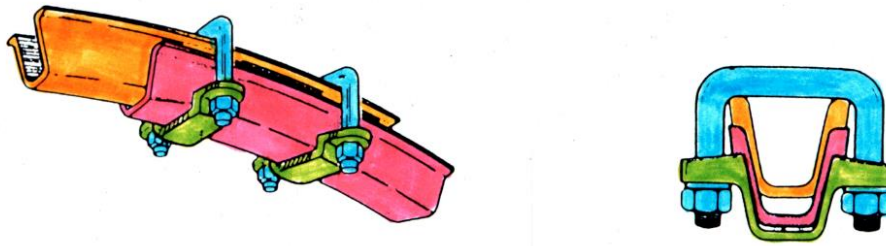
Assembly of a sliding joint in a top hat section steel set.
